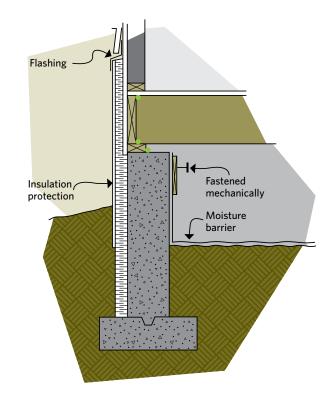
Insulating outside the crawl space is similar to insulating a full basement
